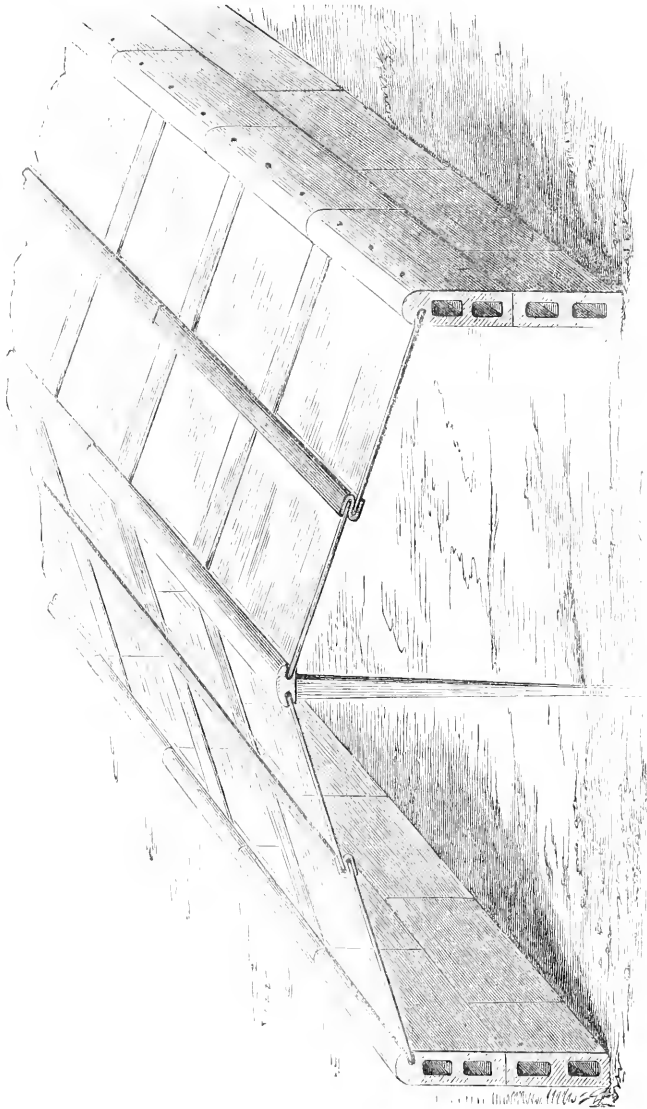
PATENT SPAN-ROOF PLANT PROTECTOR (6 and 8 feet wide).
